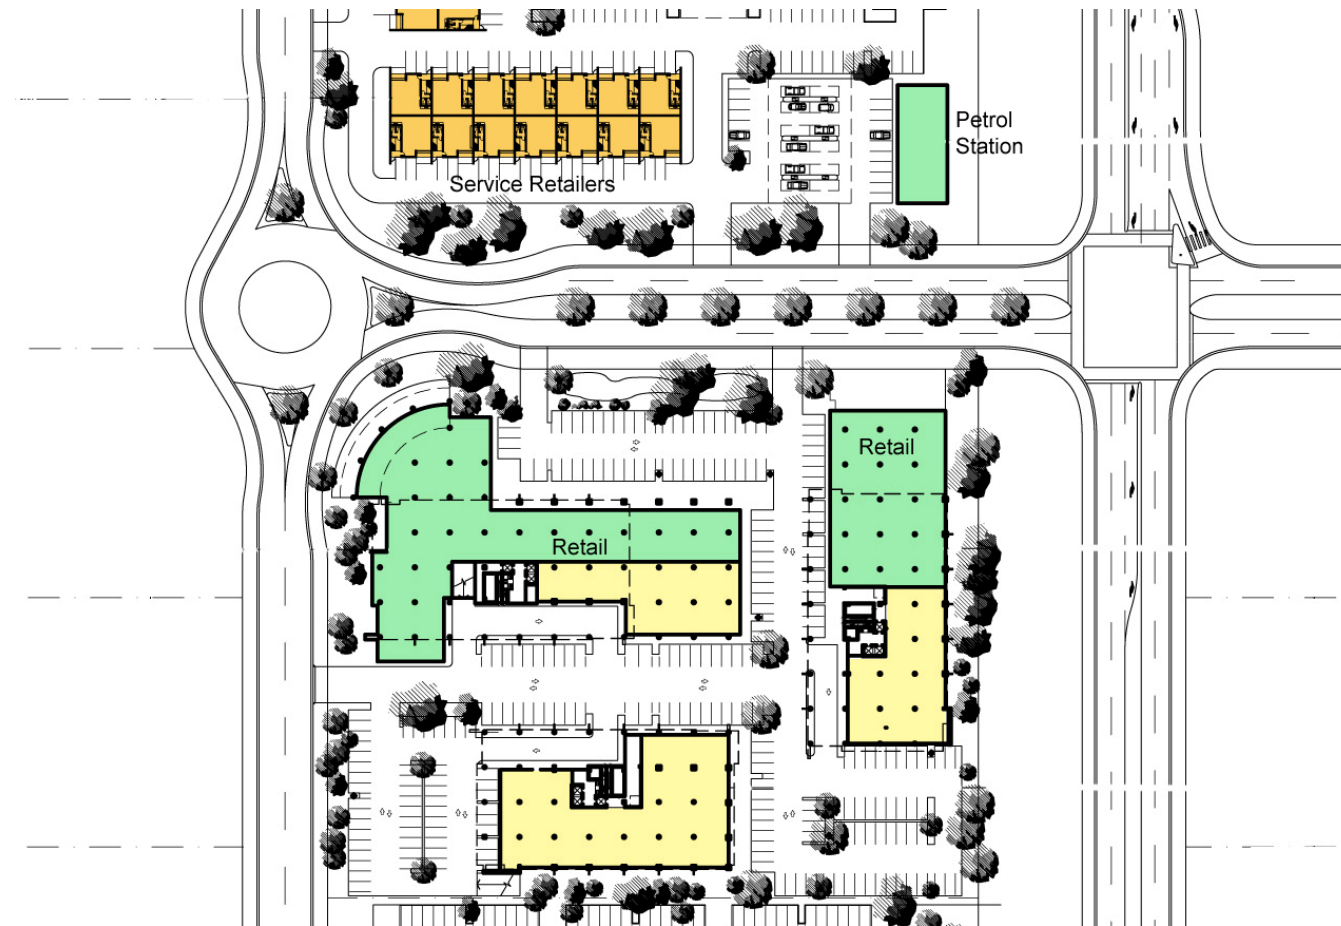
Indicative Service Retail Layout (Part Plan)
